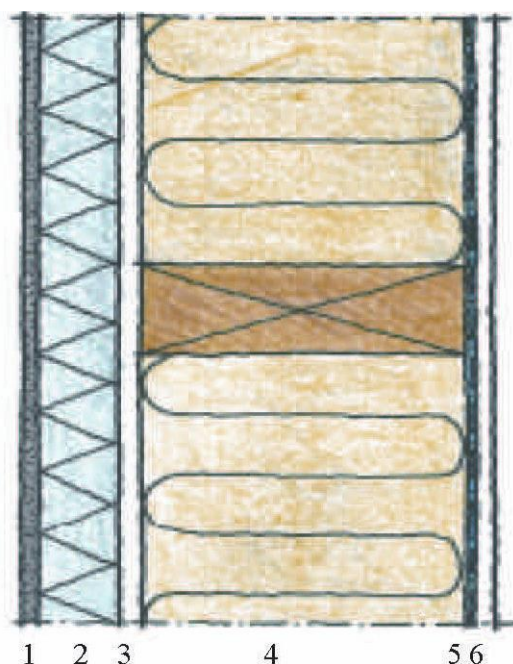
Sketch of system on a light wall from Samuelson 2009, 1- plaster layer 2- external insulation 3 gypsum plate 4 internal heat insulation 5 vapour barrier 6 gypsum plate
